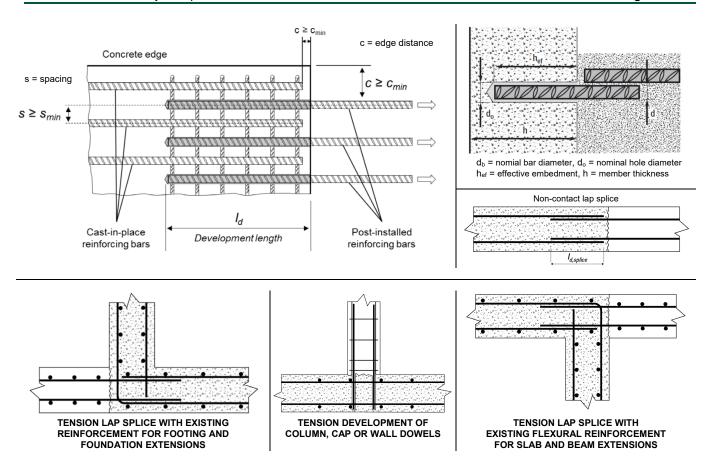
INSTALLATION DETAIL FOR POST-INSTALLED REINFORCING BAR CONNECTIONS (Top Pictures), EXAMPLES OF DEVELOPMENT LENGTH APPLICATION DETAILS FOR POST-INSTALLED REINFORCING BAR CONNECTIONS PROVIDED FOR ILLUSTRATION (Bottom Pictures)
